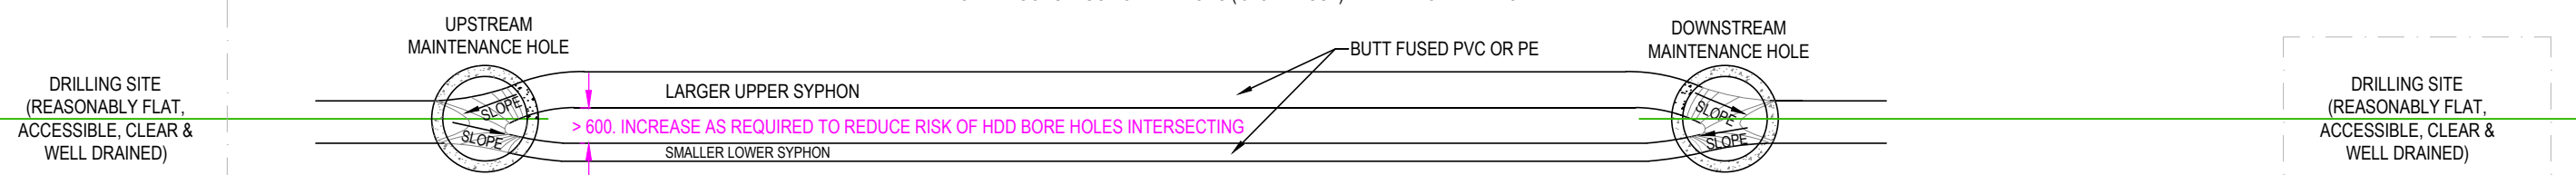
C: SYPHON CROSSING (PLAN VIEW)
